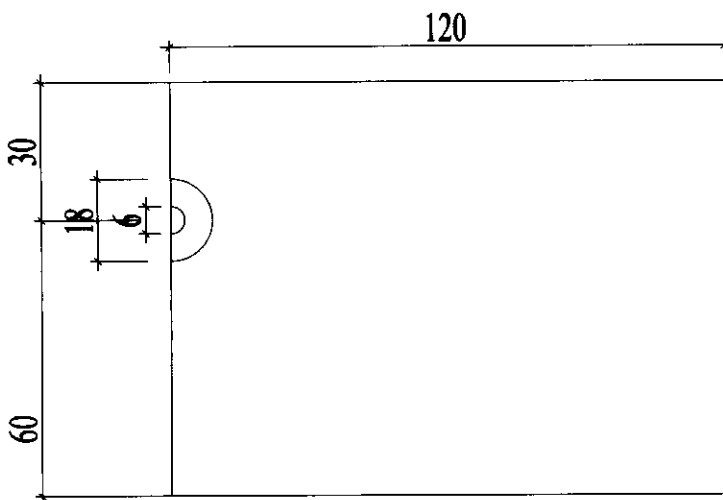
Cross-section of tunnel model at 30m depth (unit: m).
